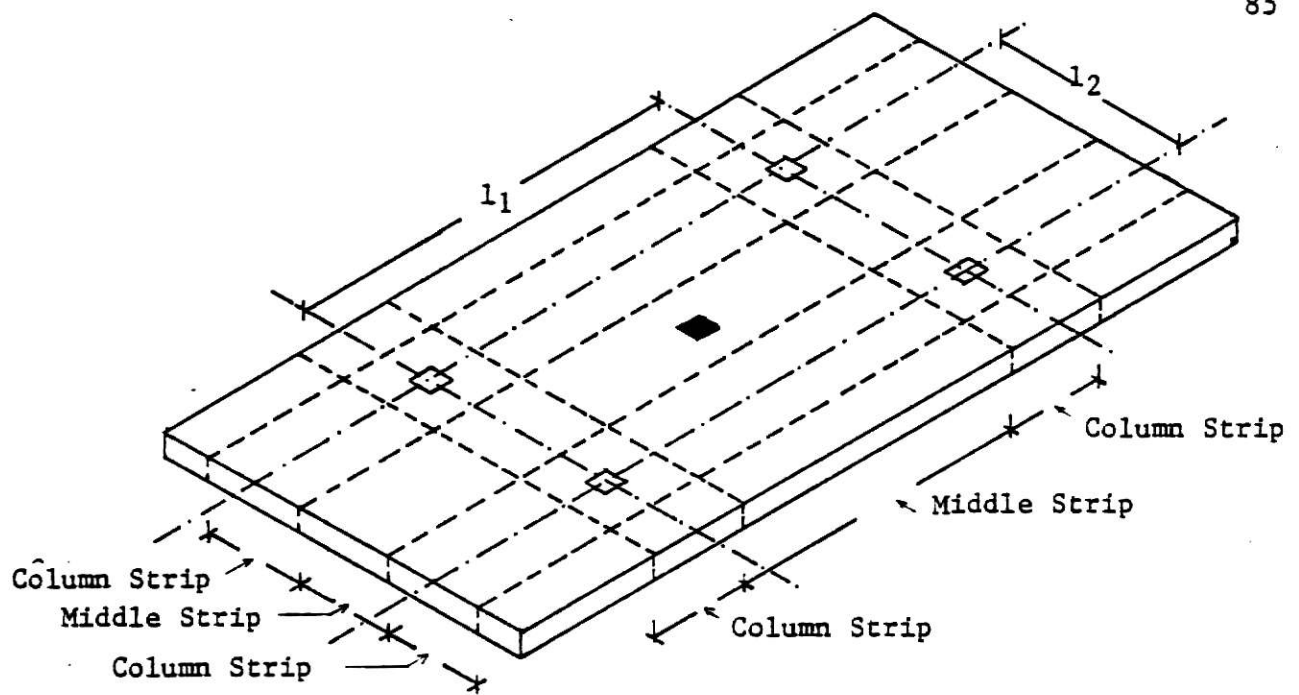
Two-Way Flat Plate Floor System Showing Equivalent Beams
